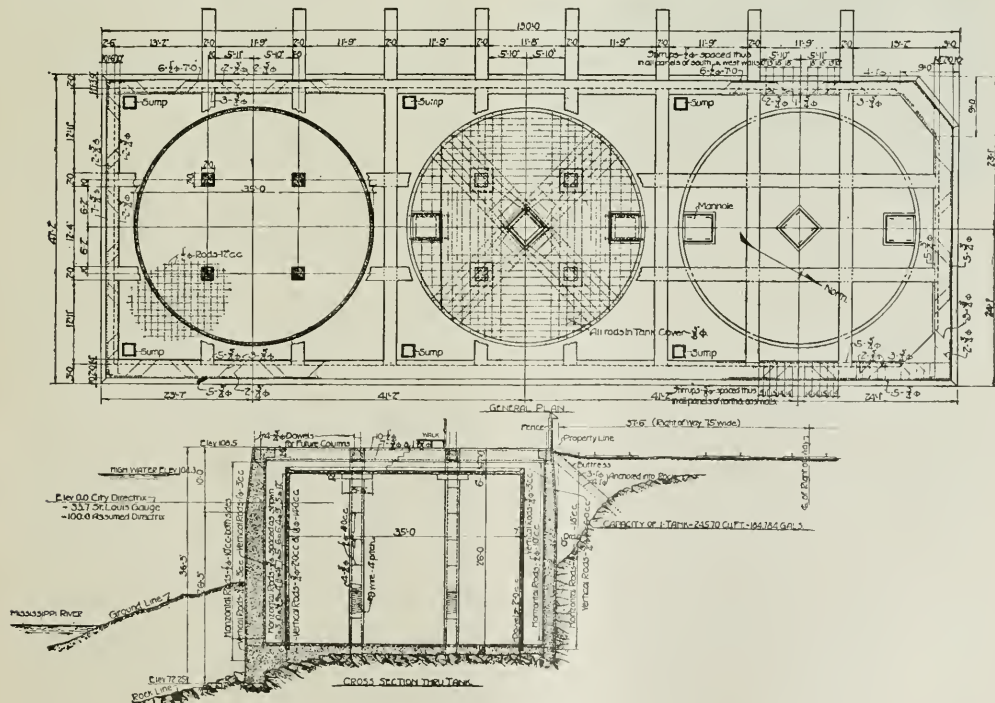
PLAN SHOWING GENERAL DESIGN, DIMENSIONS AND DETAILS
